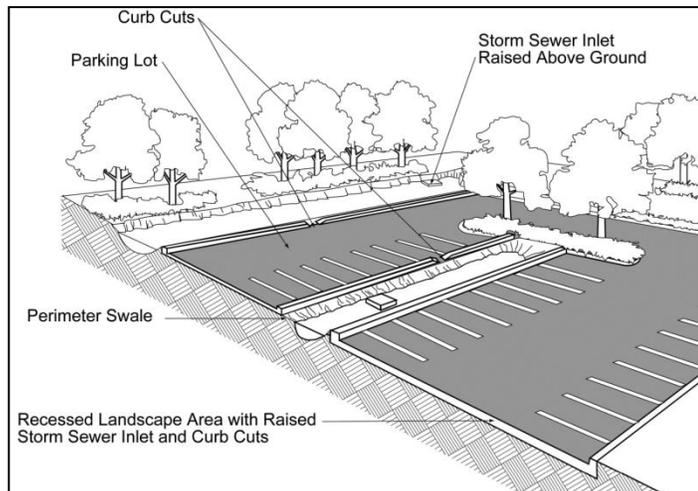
Schematic of a typical parking lot swale drainage. (Source: Northern Illinois Planning Commission)
